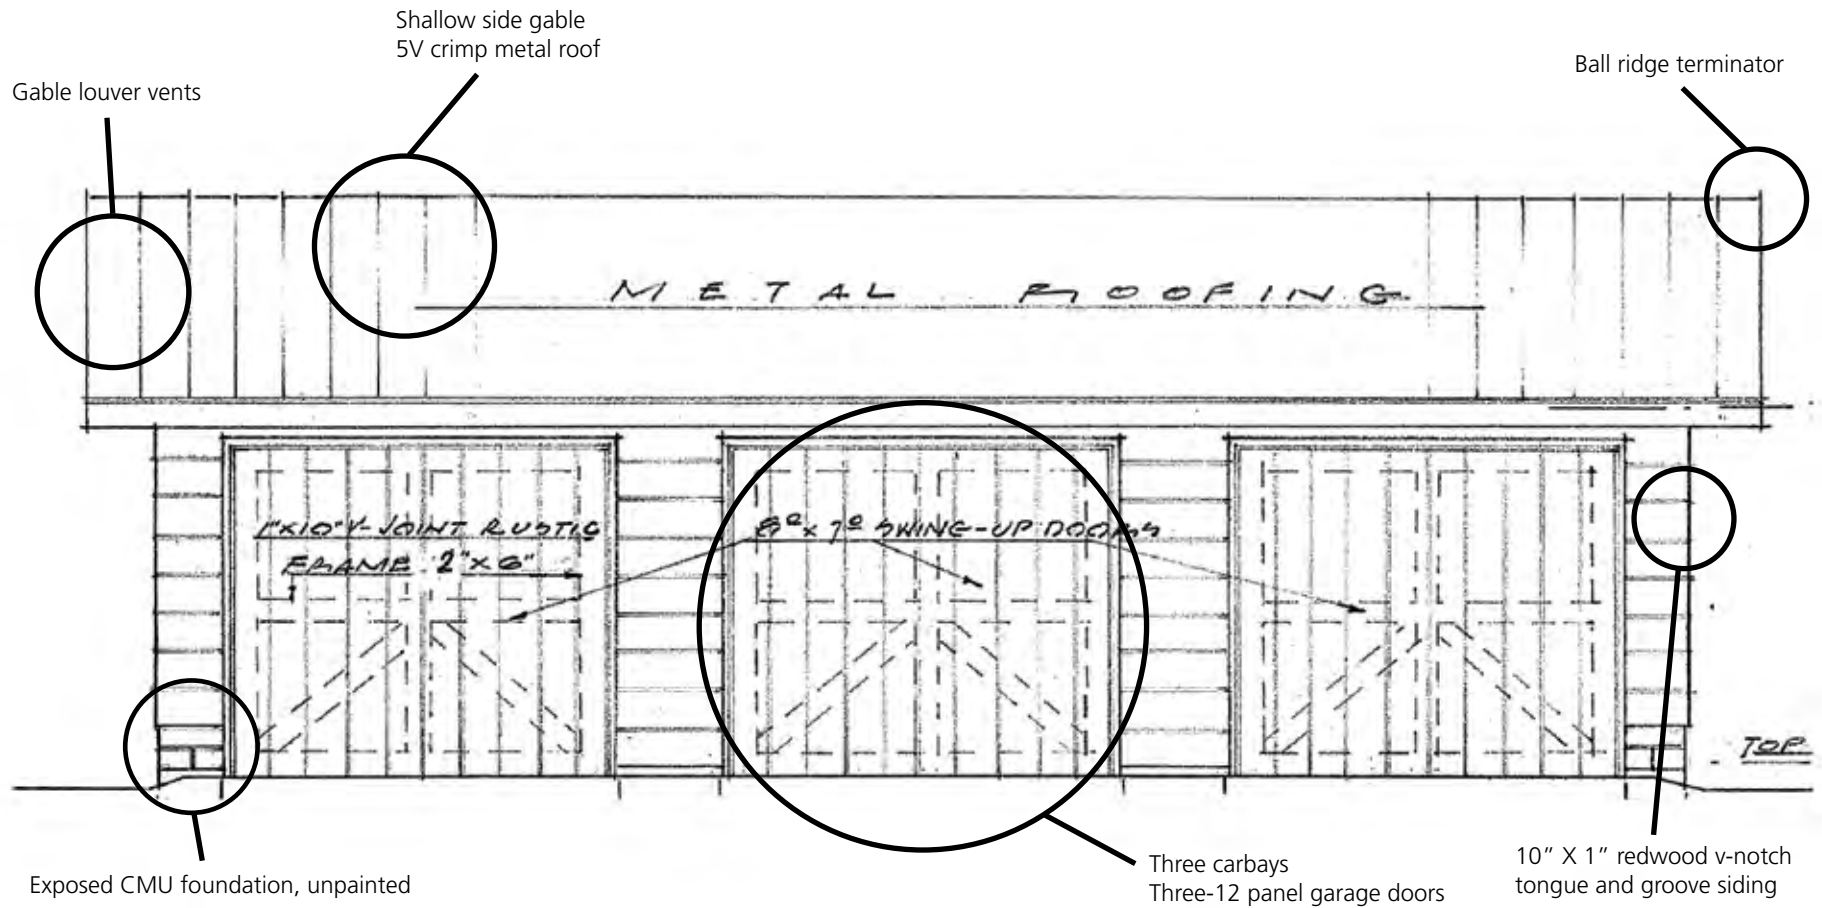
Building 217, South Elevation, 2014, AKRO Files
